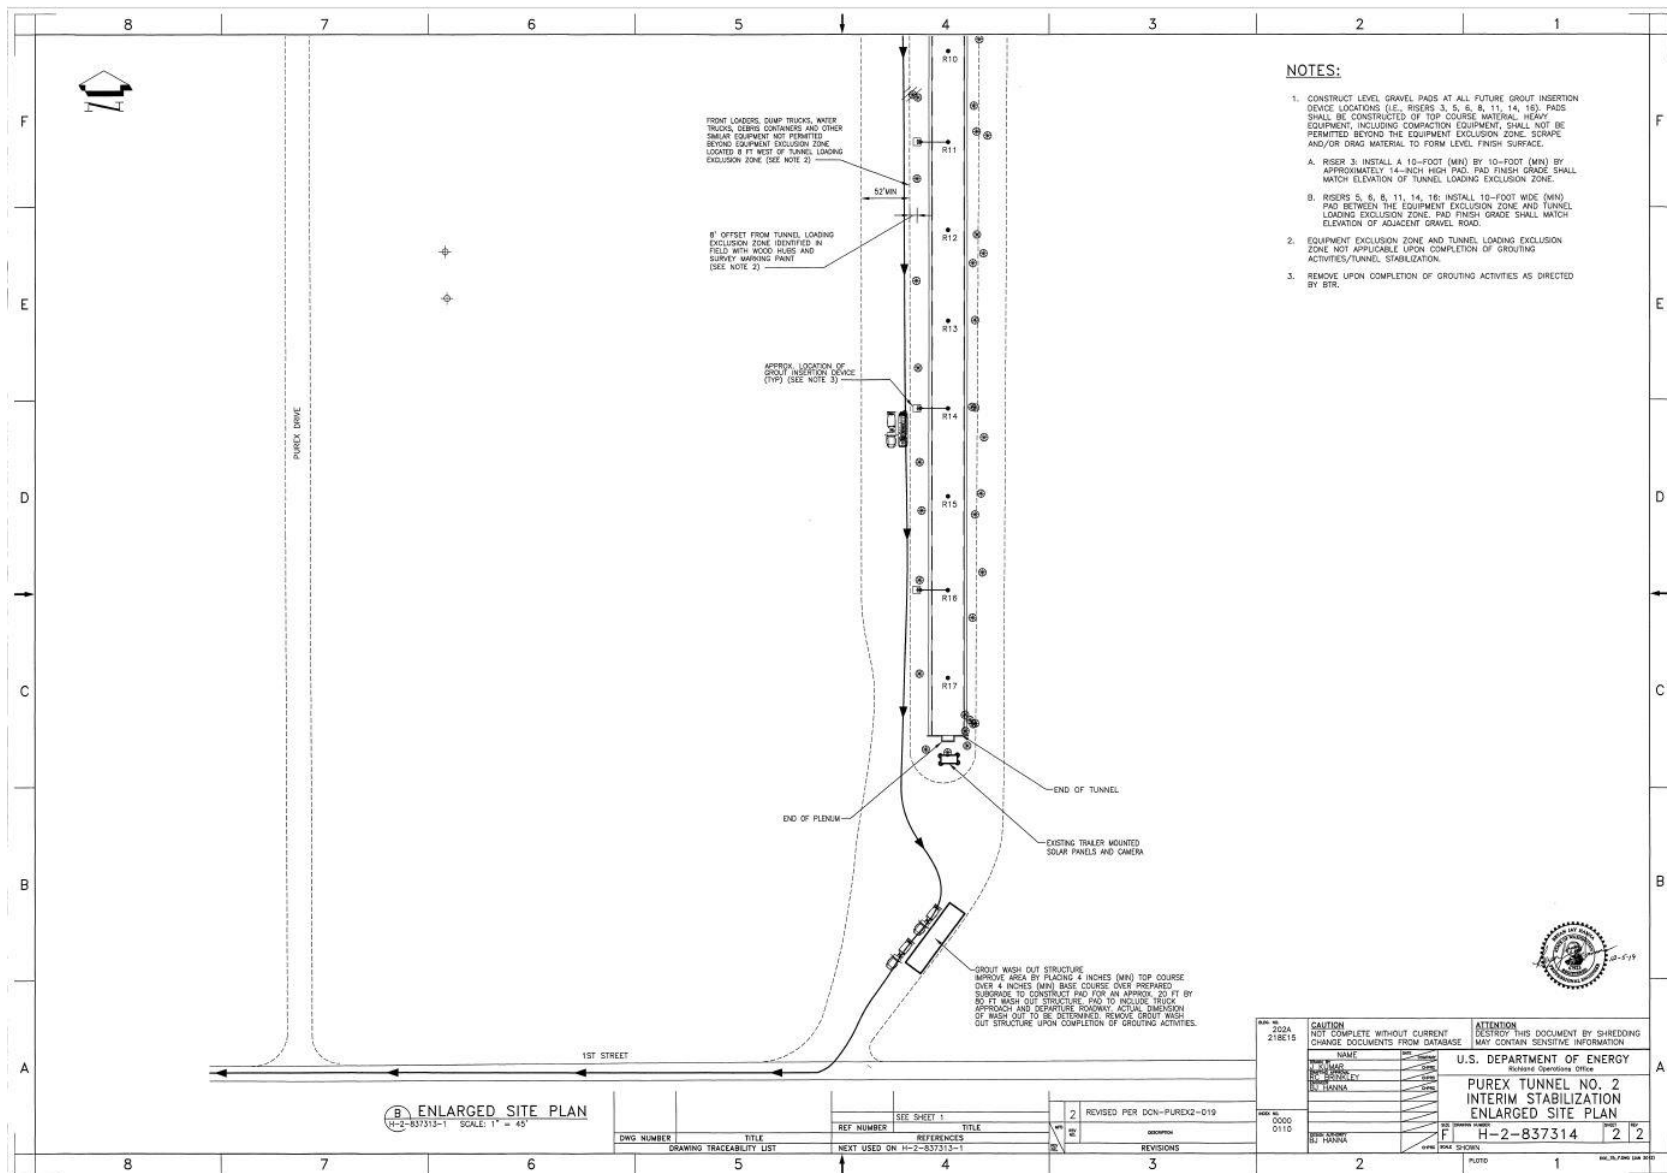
PUREX Tunnel No. 2 Interim Stabilization Enlarged Site Plan 1, #H-2-837314-1
